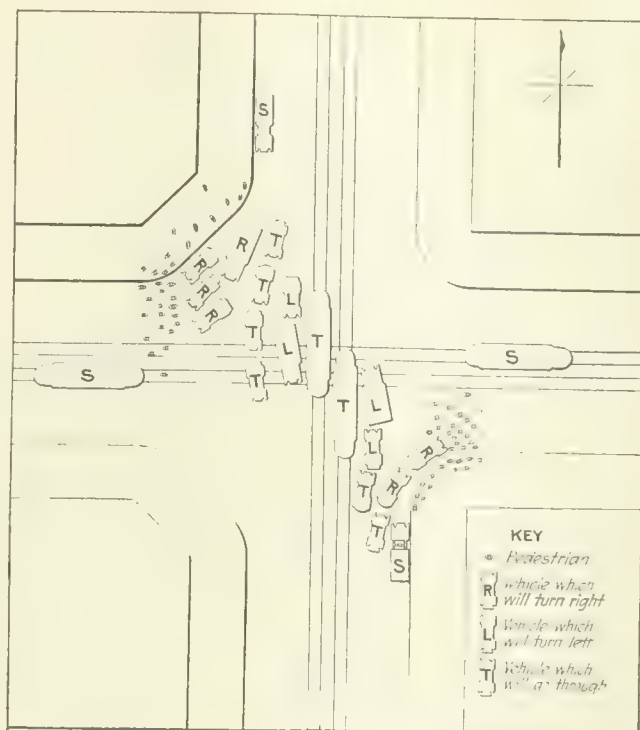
INTERSECTION SHOWING APPLICATION OF TRAFFIC-STORAGE PRINCIPLE
